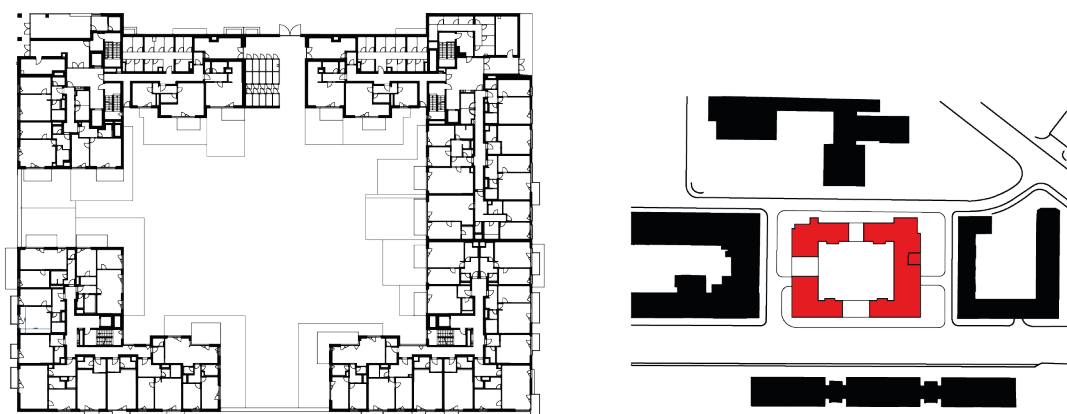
Housing complex 4Blok – floorplan and urban situation
